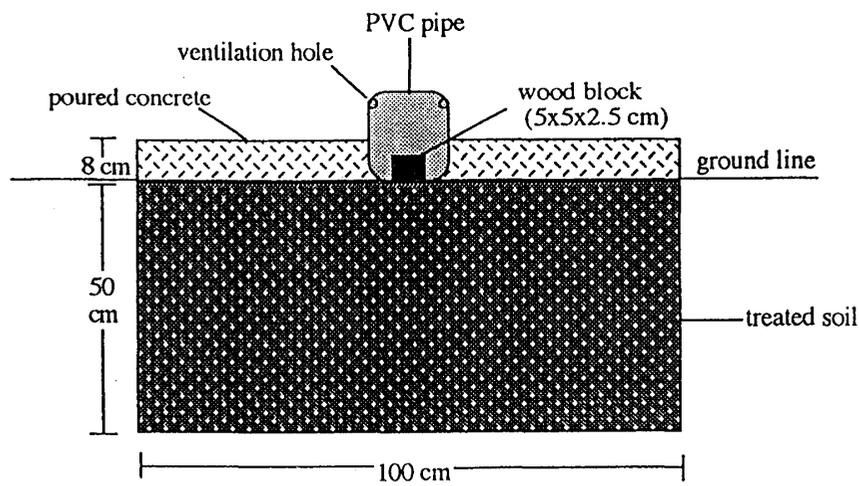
Standard modified ground board test (MGBT) or concrete slab test.
